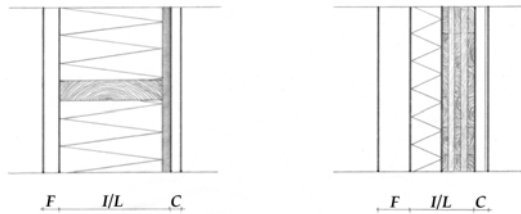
Sections of a light and a massive timber wall structure. Façade; Insulation/Load-bearing; Cladding.
